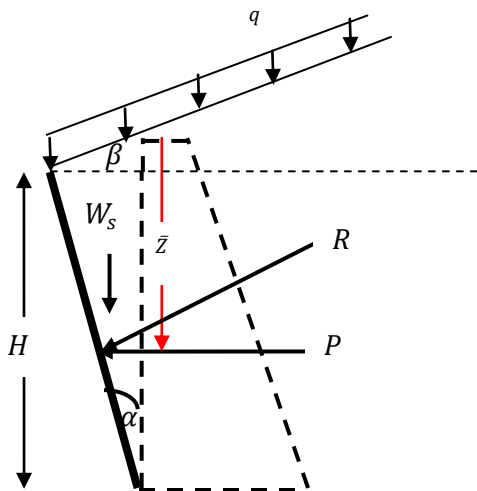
At-rest force for a retaining wall with an inclined backface and inclined ground.
